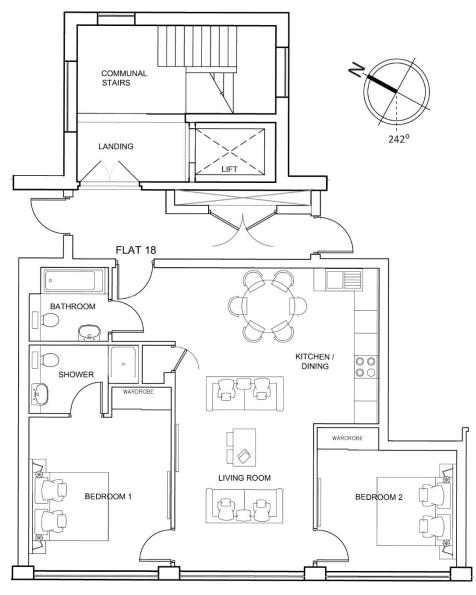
Apartment 13 and 18 Layout of Case Study 1
